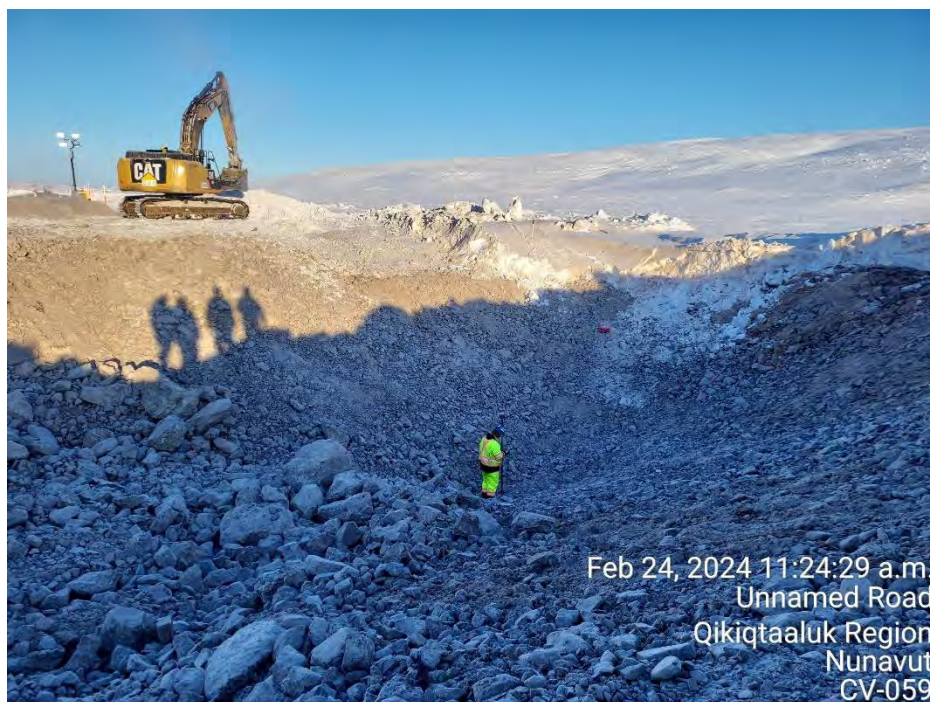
CV-059 looking northeast at the blasting excavation in the area of the culvert inlet (February 24, 2024)
